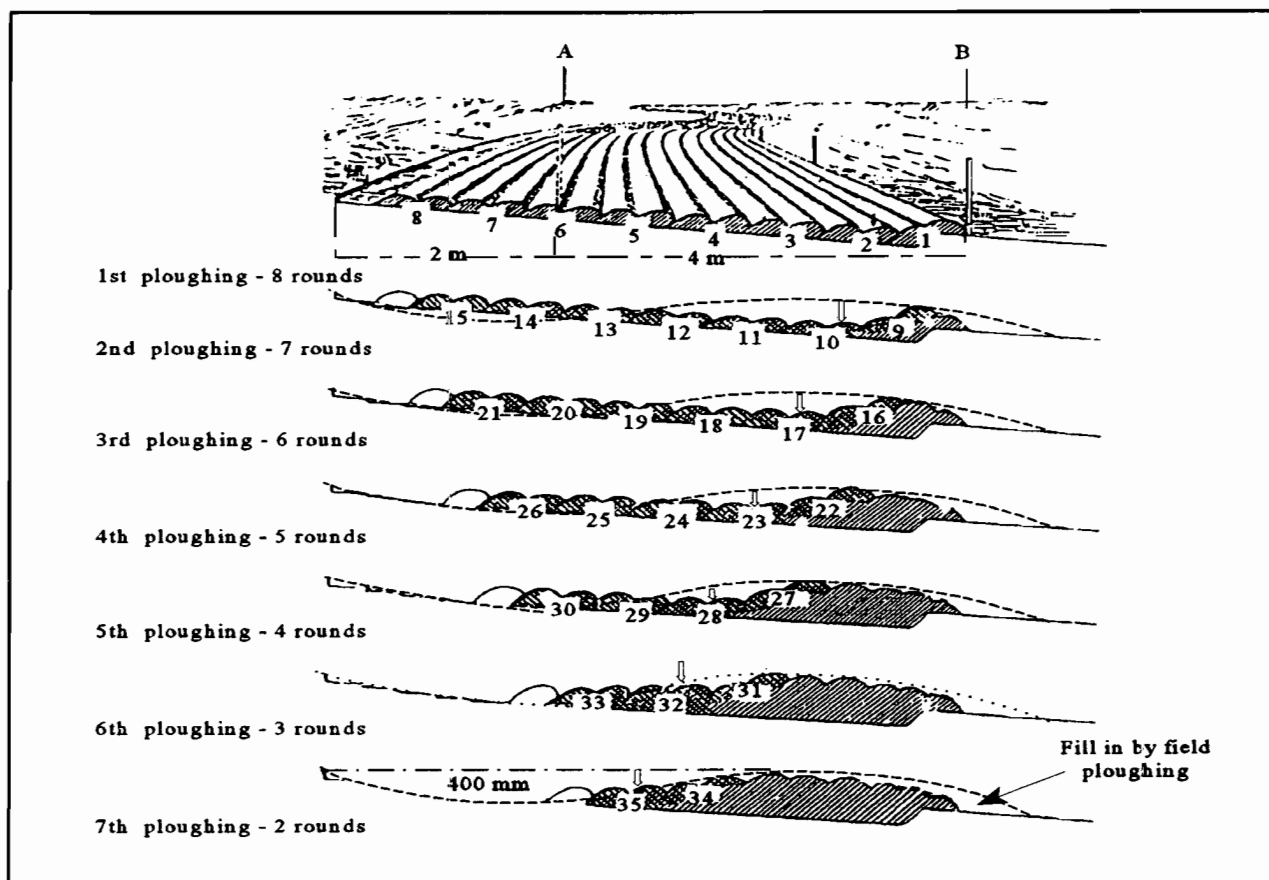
Method for contour bank construction with a two-furrow reversible plough.
